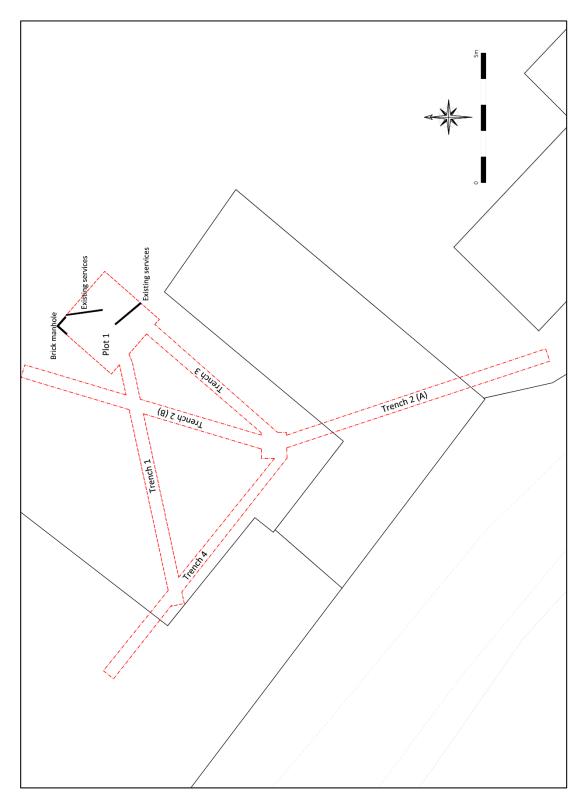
Layout of development site and monitored ground works (scale 1:150).
